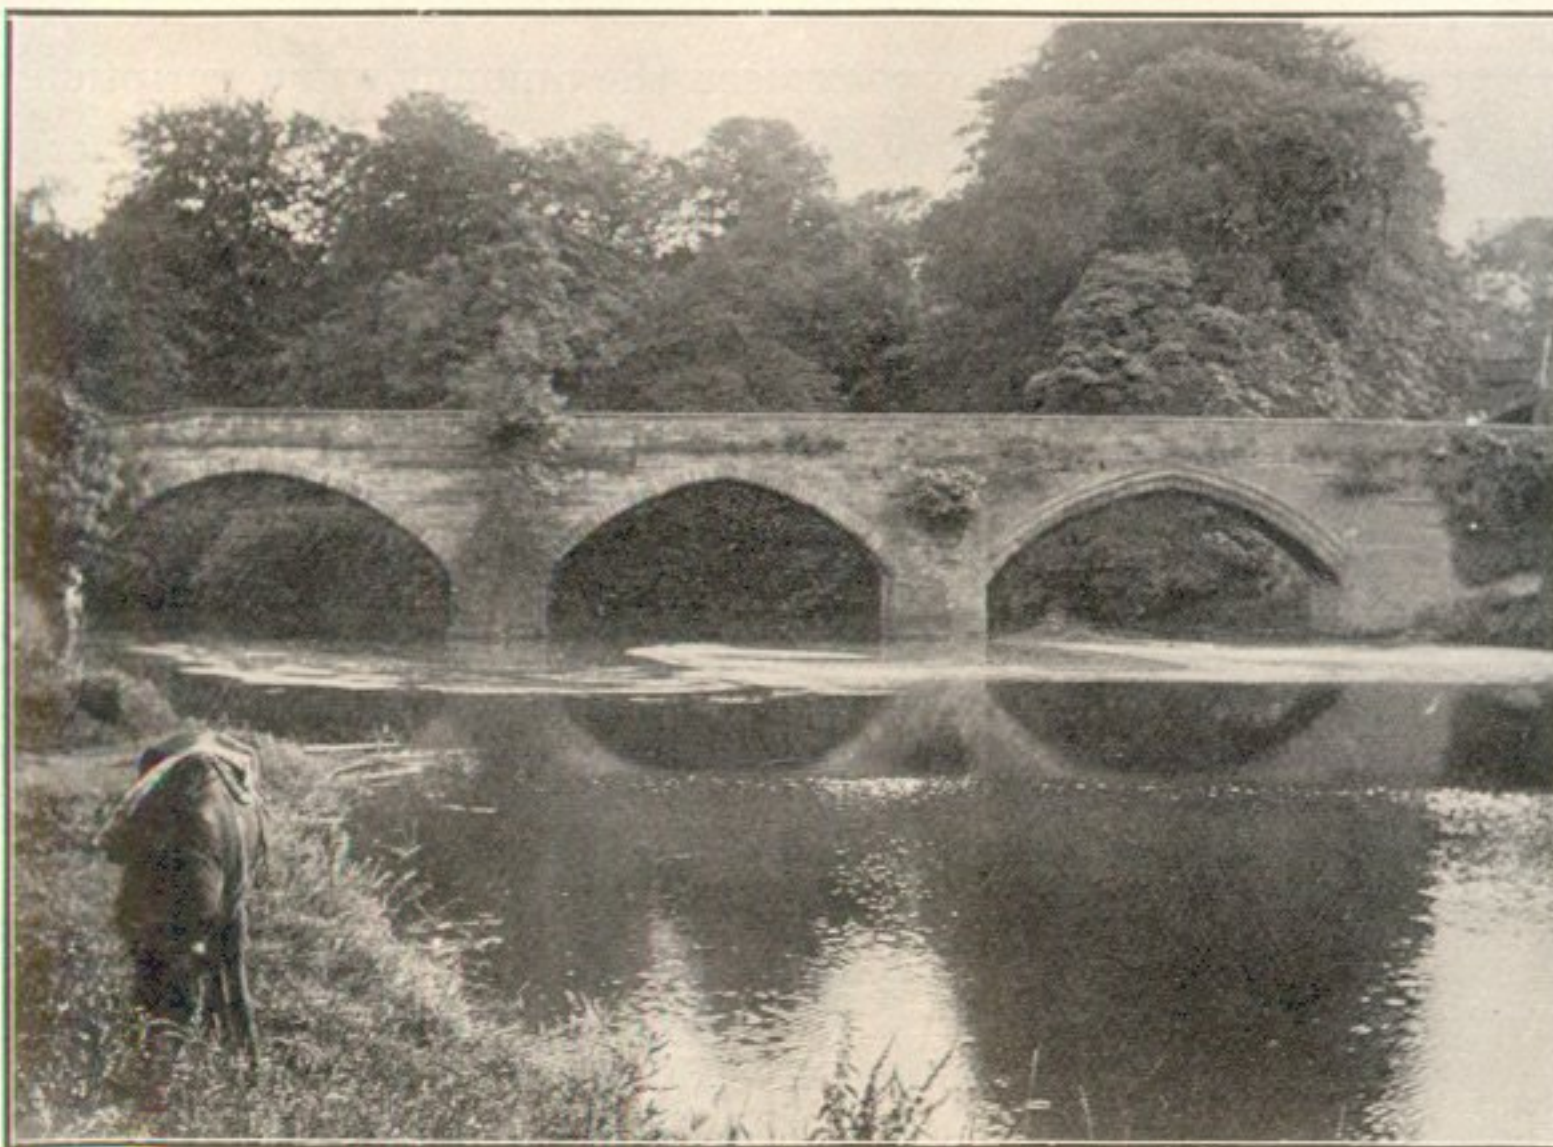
Cramond Bridge, exhibiting the old ribbed and pointed arch, and the rebuilt arches of later date. (Fell 1587; rebuilt 1619.) Roadway 13 feet 6 inches.
